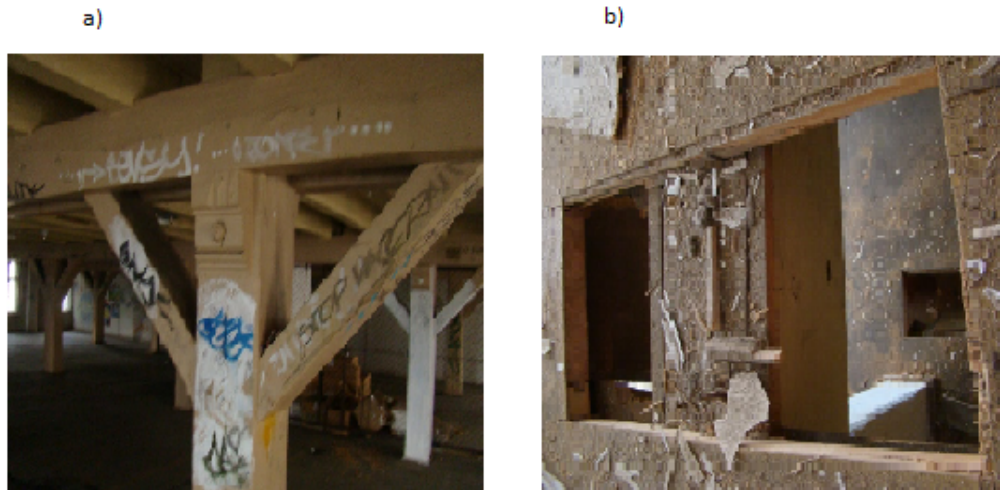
Building planned for modernization ceiling above the first floor: a) fragment of the wooden frame, b) structure of the ceiling
